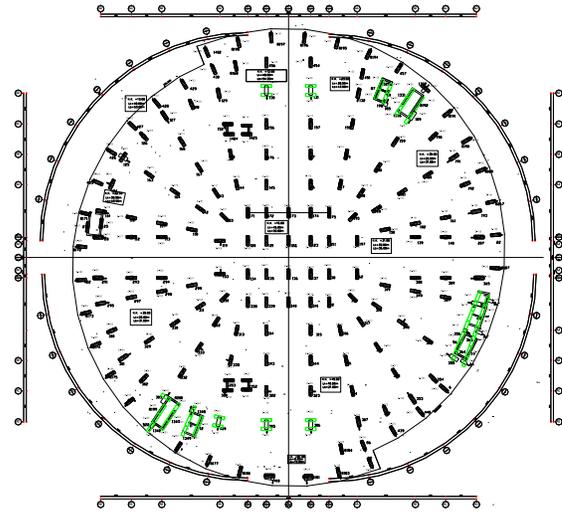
Layout of Columns and Foundations (Durgunoglu, 2013)
